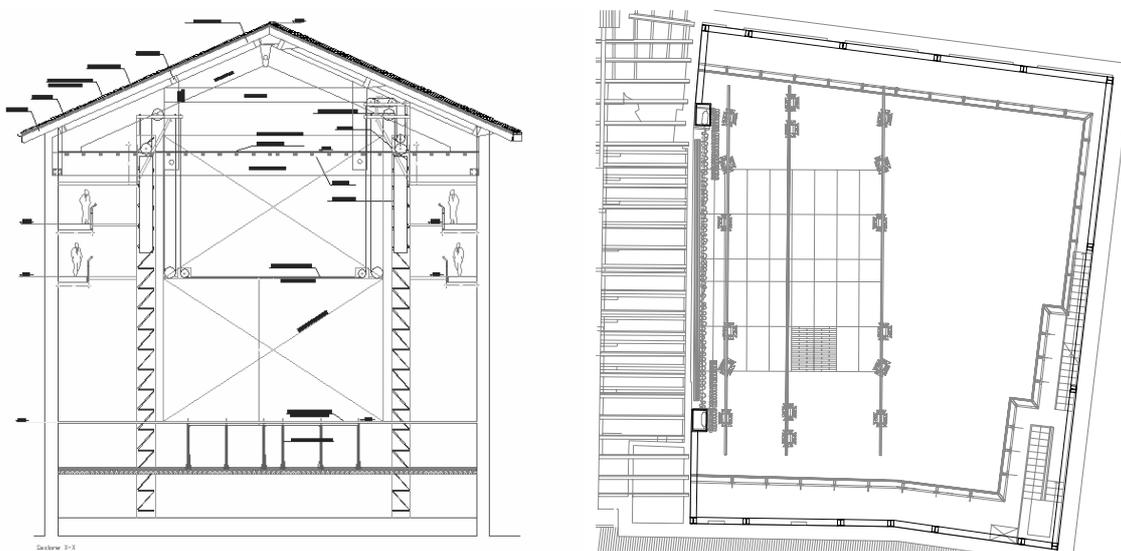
Floor plan and section of the earthquake resistance steel structure for the fly tower.
